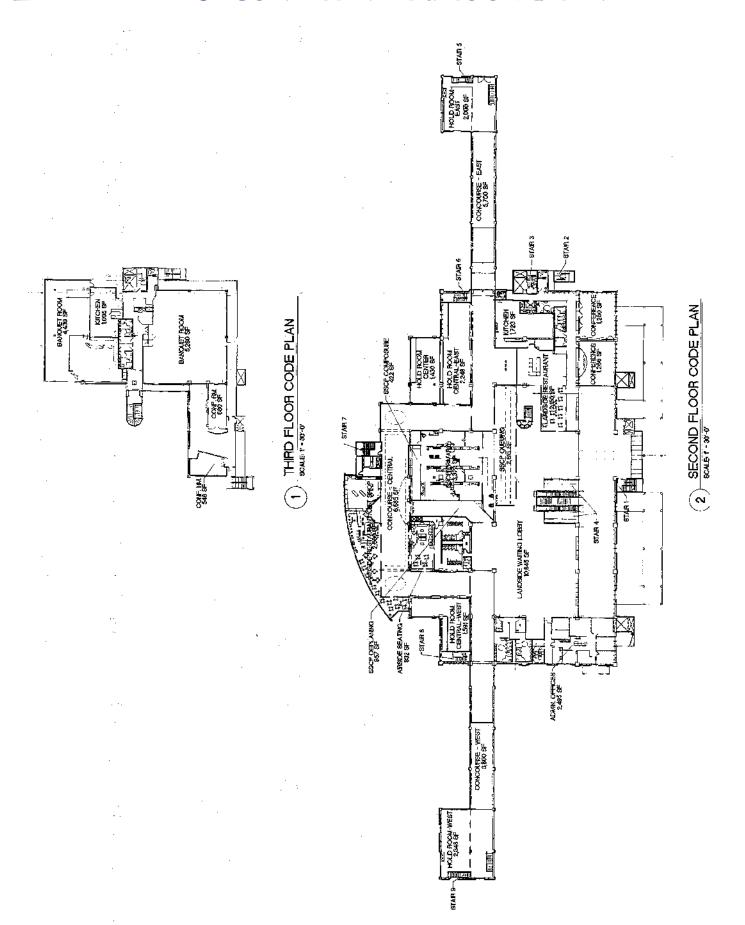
# EXHIBIT C - SECOND LEVEL FLOOR PLAN
